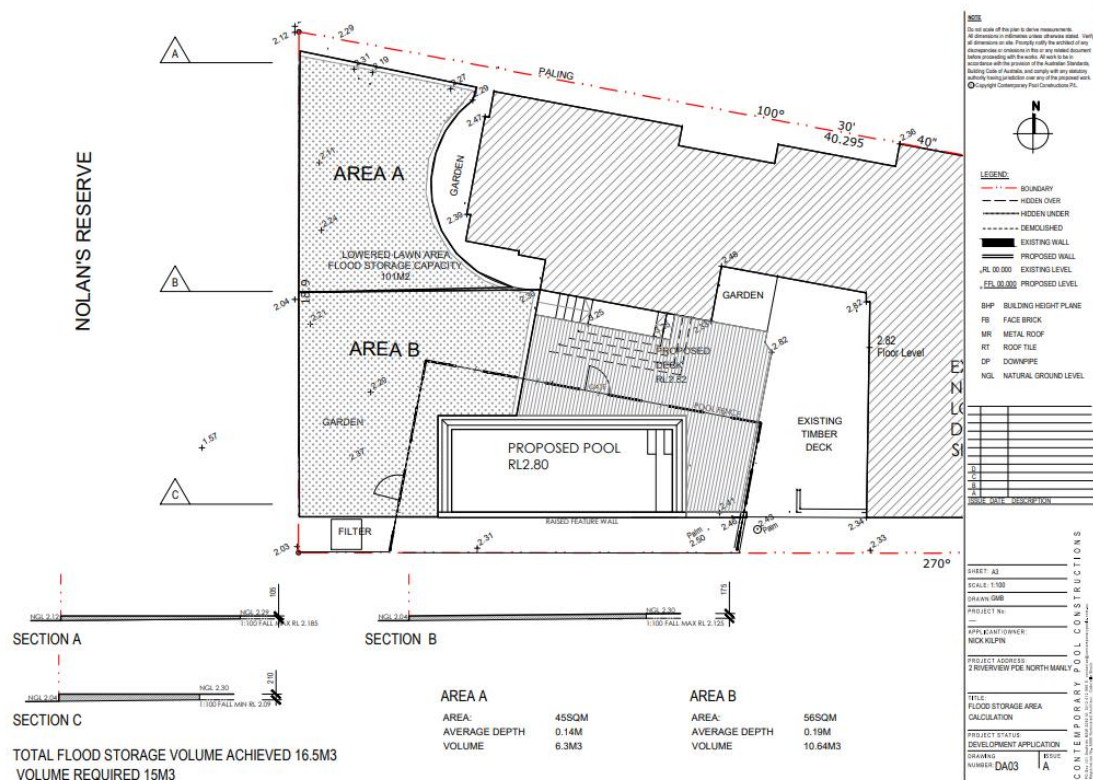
Site plan (Source: Contemporary Pool Construction)
